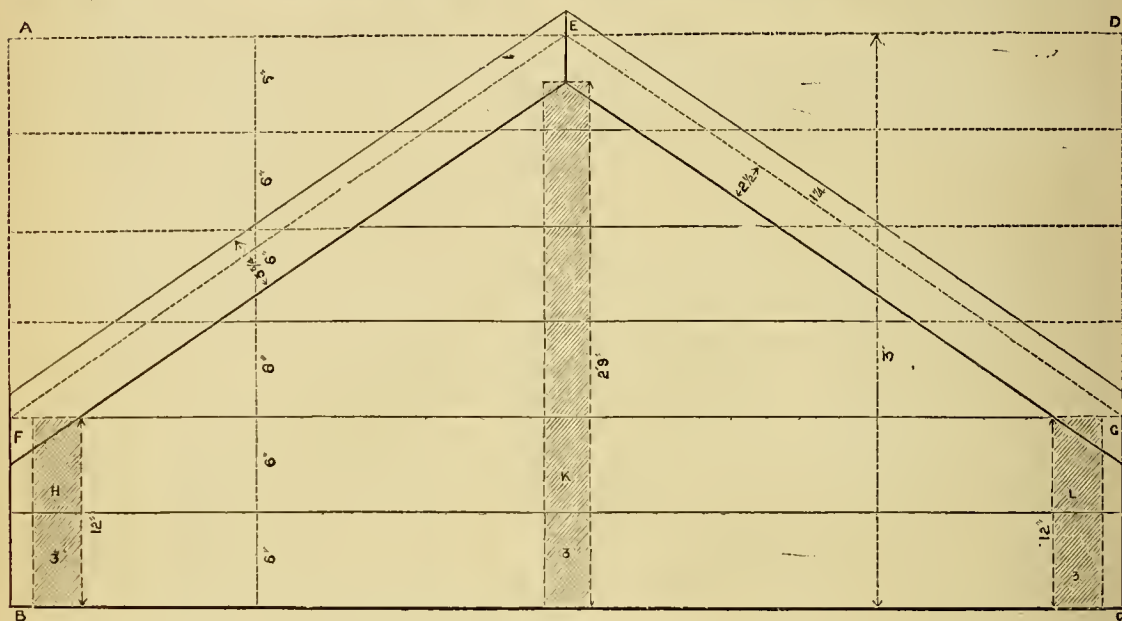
END OF SPAN ROOF GARDEN FRAME, SHOWING ITS CONSTRUCTION EXTERNALLY AND INTERNALLY.
